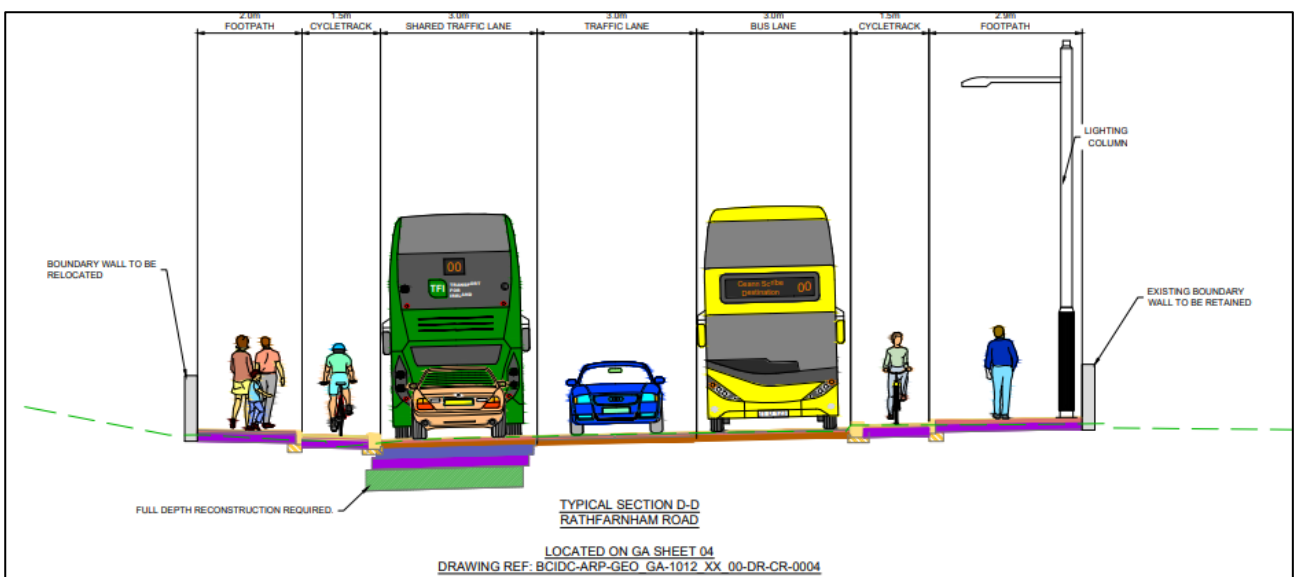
Typical Cross-Section adjacent to Rathfarnham Road and Dodder Park Road Junction
